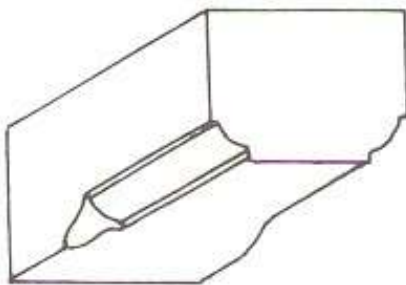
Diagram of moulded ceiling beam, dated to the late 16th – 17th century, from Brown, 1986, p.60
